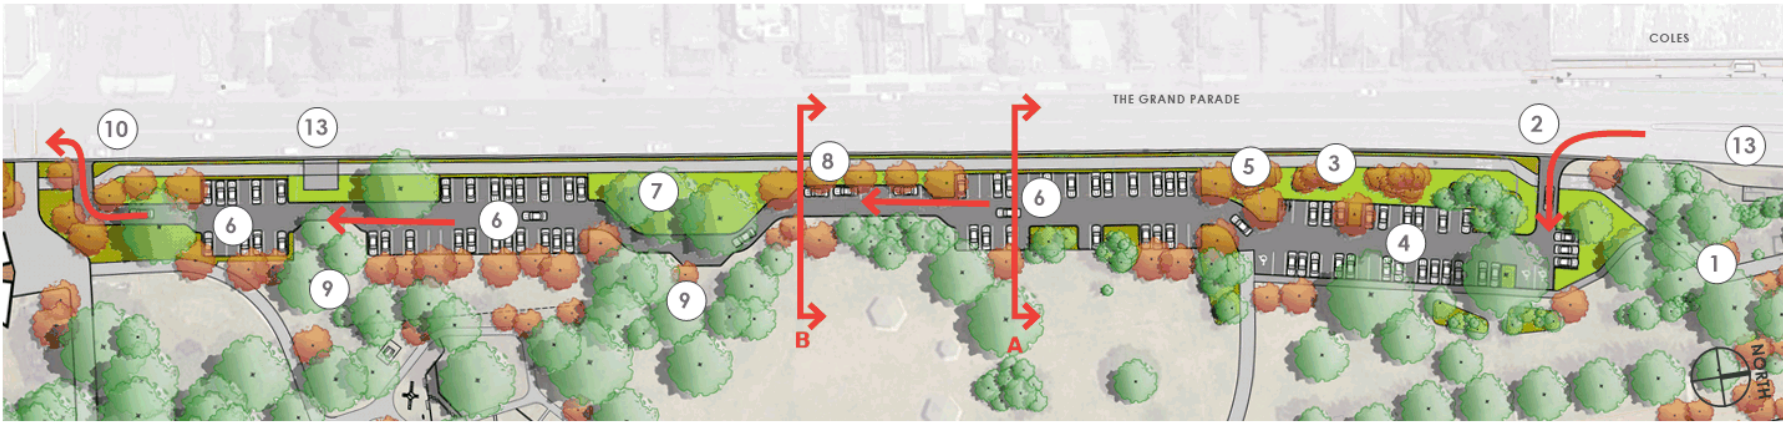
Plan of carpark in northern section (Scale 1:1000)
